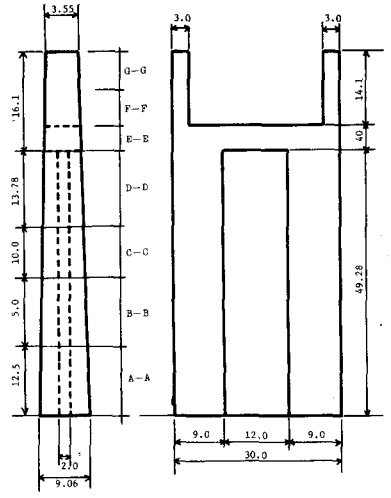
Dimension of High Elevated Reinforced Concrete Pier
